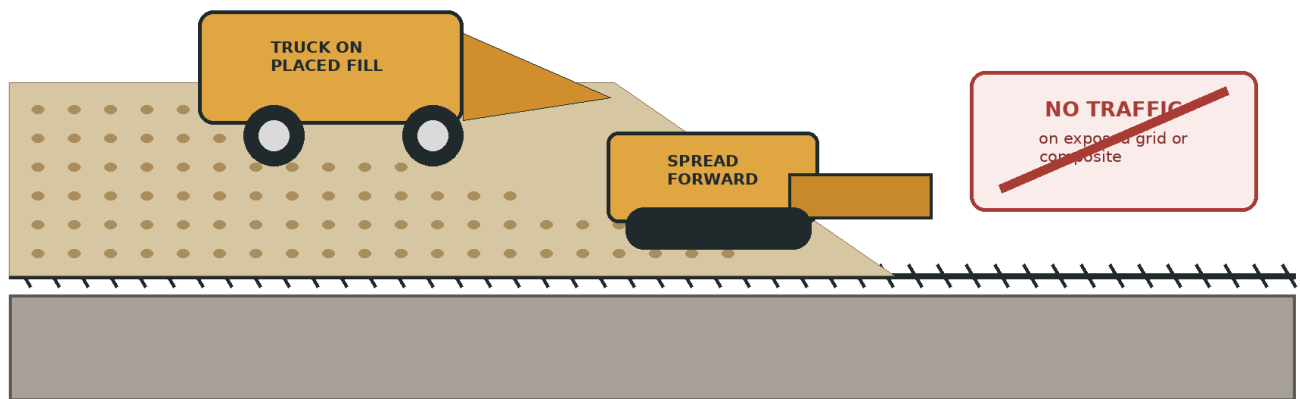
Place fill from the covered side and spread forward without exposing or dragging the grid.
